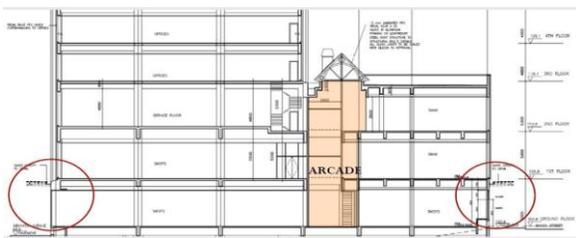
Section through the building. (Source: Planning Systems Services (Author 2016)
